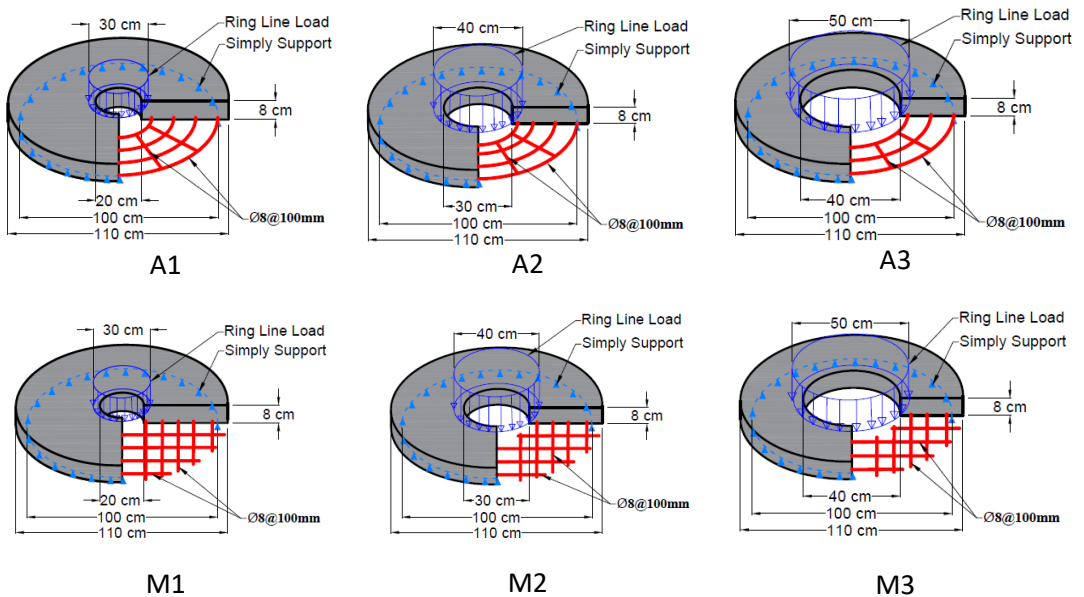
Geometry, reinforcement, supporting, and loading of the radially and orthogonally reinforced annular slab.
